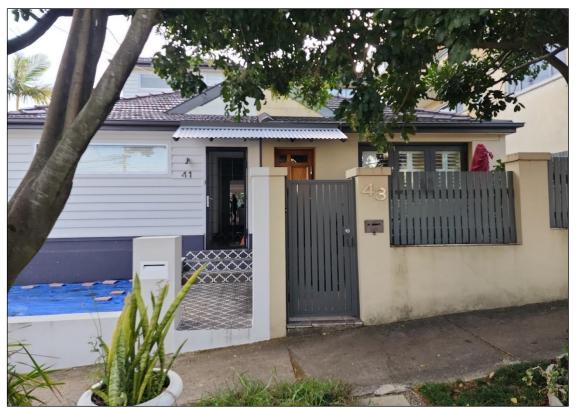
South/front fence and entry to the site and east adjoining dwelling at 43 Oberon Street.
